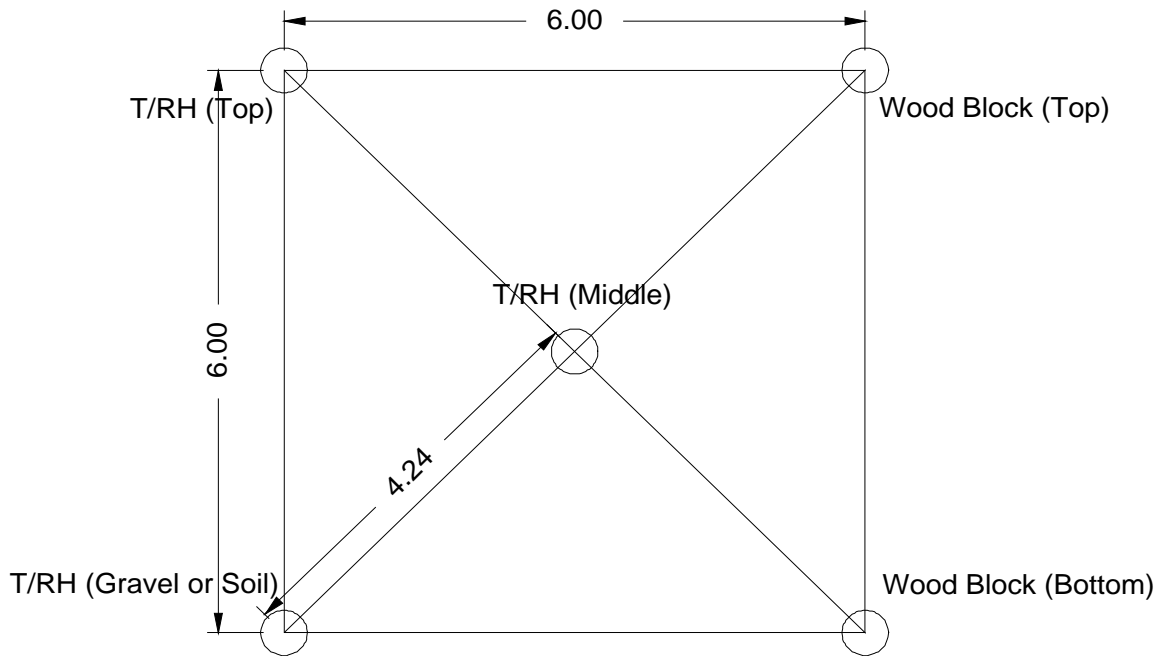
Plan view of the typical pattern of sensor placement for instrumented clusters in poured walls and slab floors (dimensions are in inches). See Figure 2 for sectional view of sensor placement.
